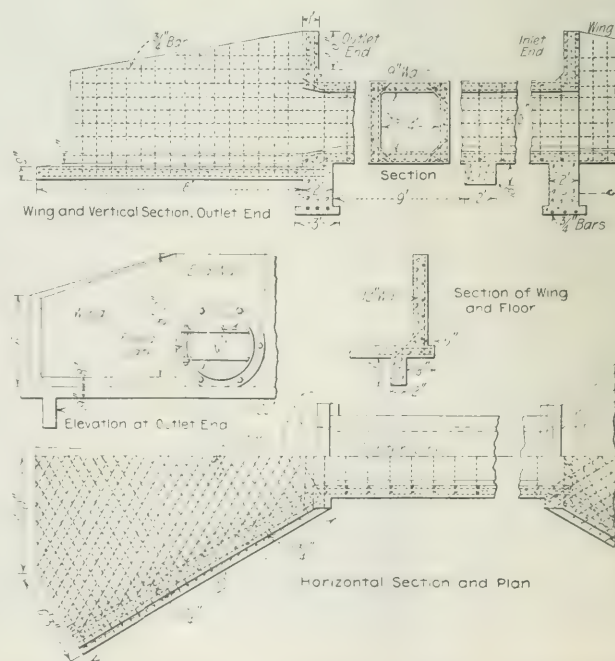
REINFORCED-CONCRETE CULVERT IN LEVEE; WITH FLOOD GATE ON OUTLET
